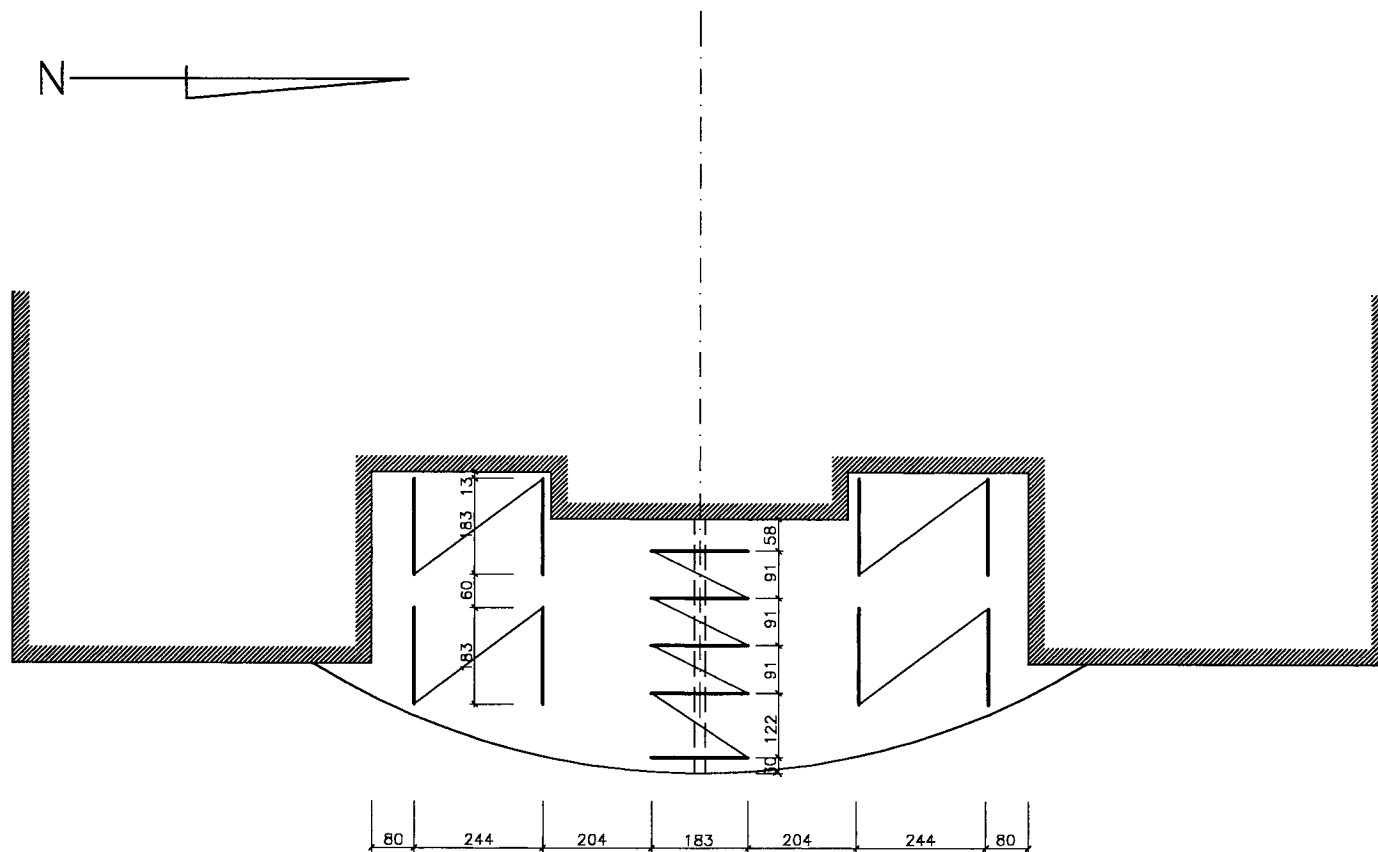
Slab Dimensions and Tower Layout (Measurements in cm)
